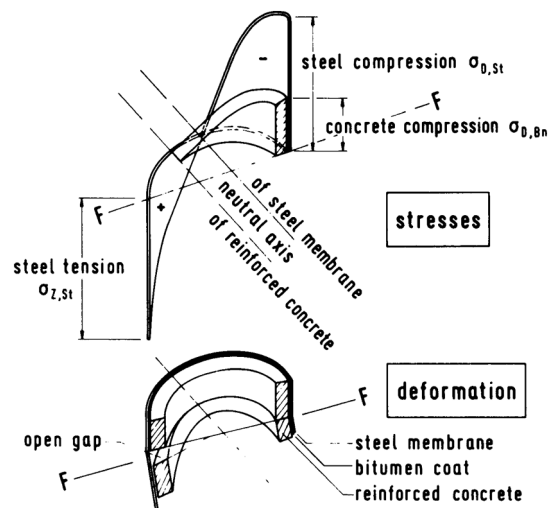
Bending stress acting on concrete lining with outer steel plate casing. Deformation (below) and stress in the steel and concrete structures.
